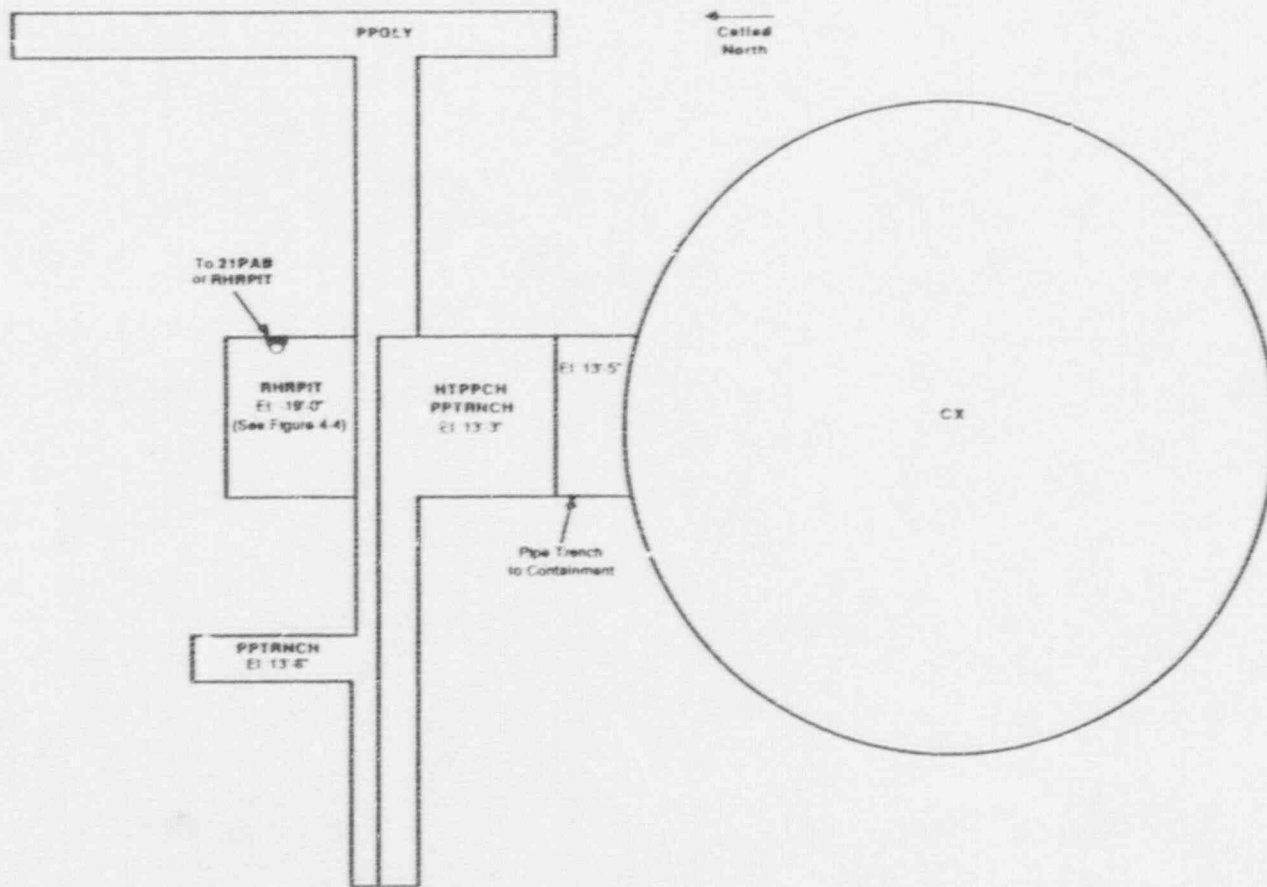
Haddam Neck Reactor Containment and Pipe Trenches, Elevation 13'-6"
